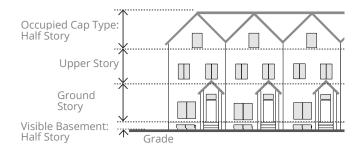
Measuring Stories with Floor-to-Floor Height
